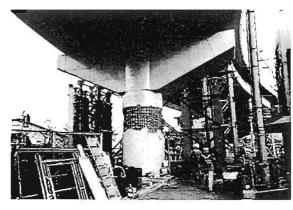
Hanshin Expressway, Kobe: Shearflexure failure at mid-height where main reinforcement is curtailed
